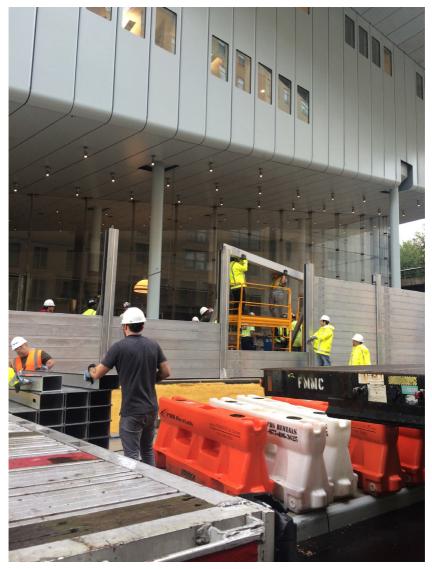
Temporary flood barriers for the Whitney Museum of American Art, New York City. The photo shows the structure and method of emplacing the barriers.
